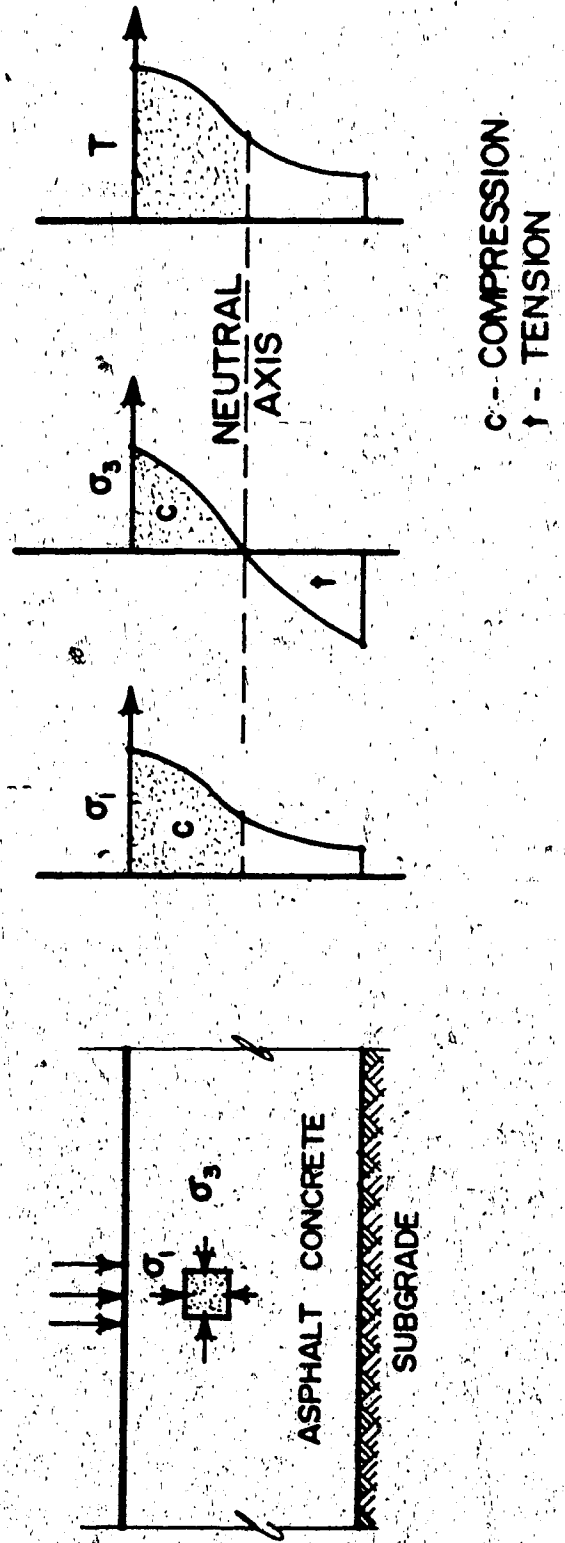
TYPICAL STRESS AND TEMPERATURE DISTRIBUTION IN FULL-DEPTH ASPHALT CONCRETE PAVEMENT.
